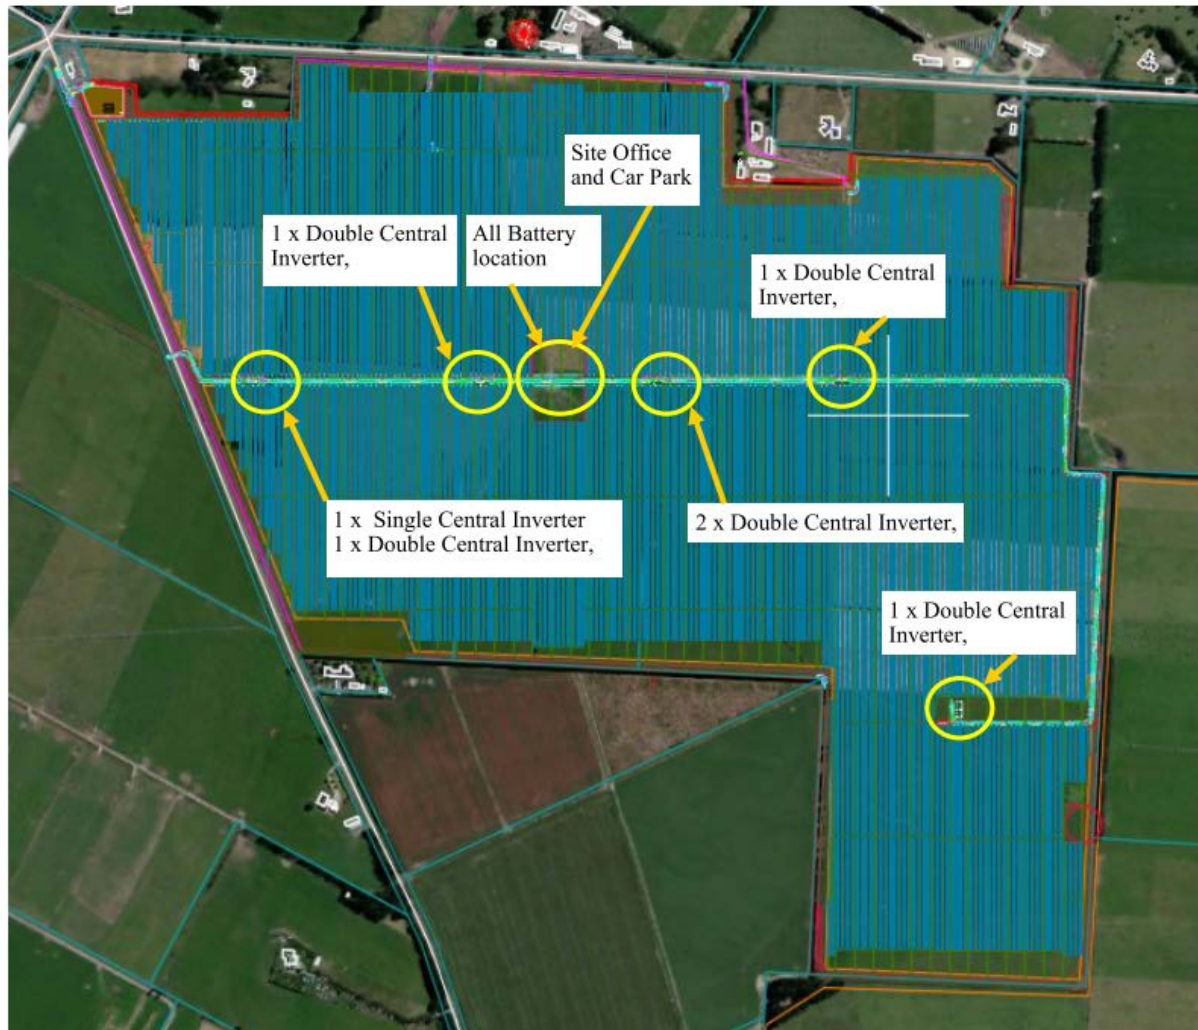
Proposed Site Layout and Battery Plan (Source: Applicant's s92 response)
